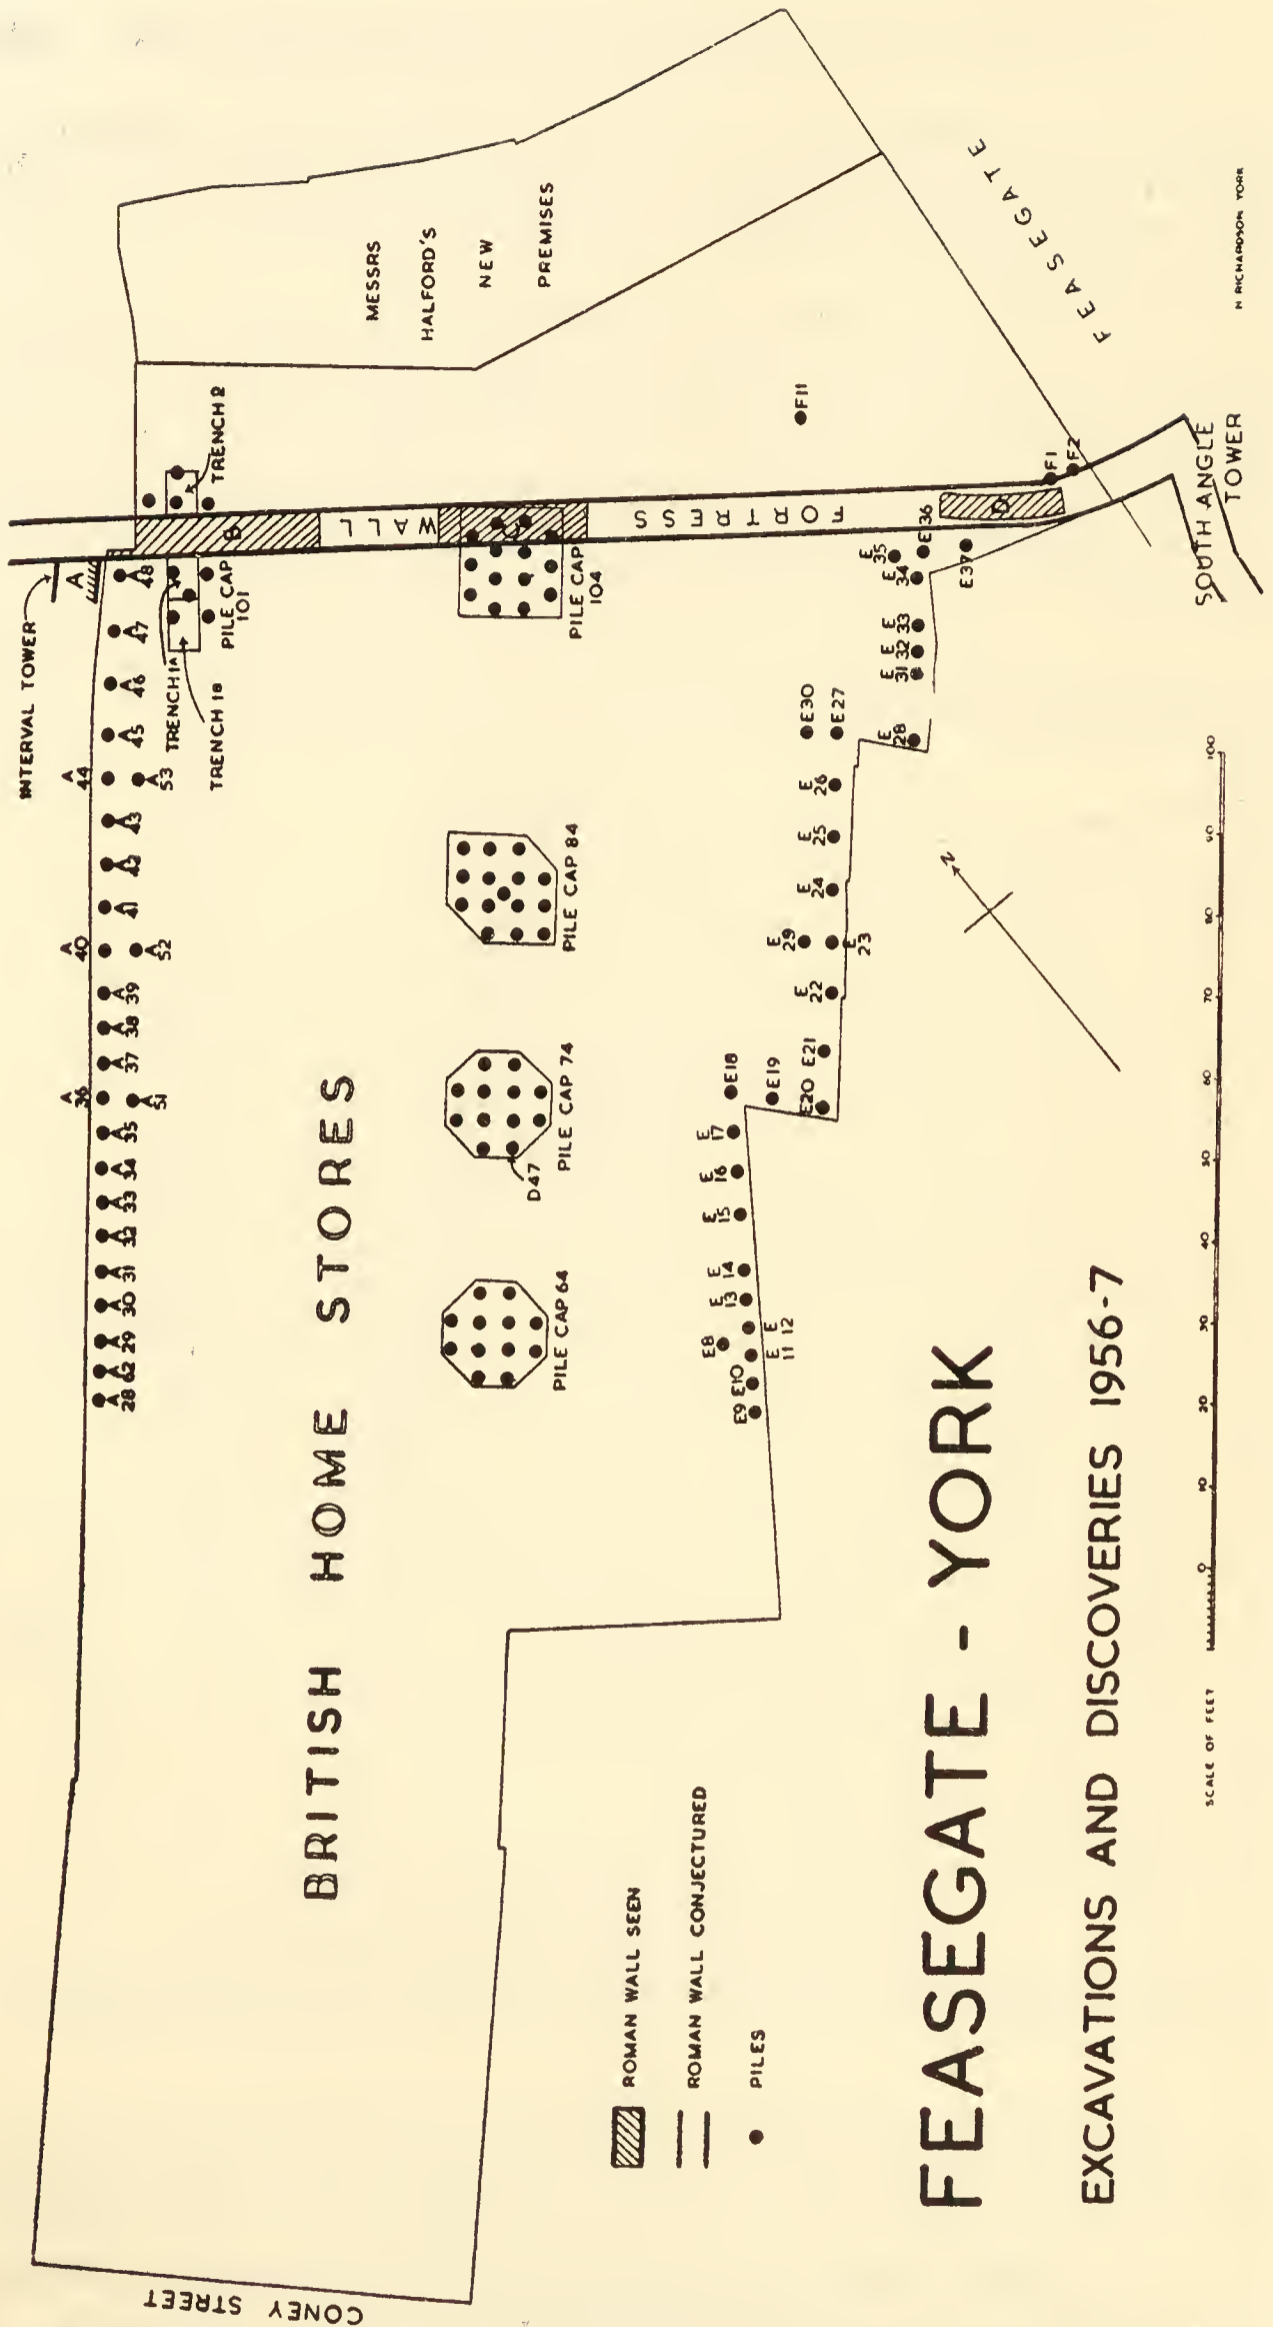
Plan of the site showing trenches dug, piles sunk and other findspots.
